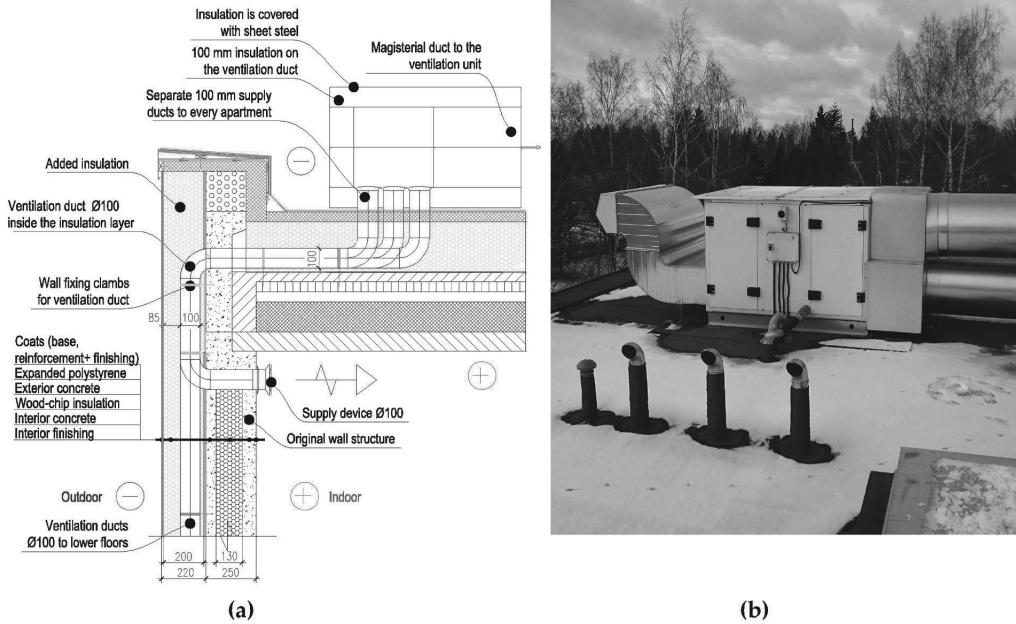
(a) Ventilation ducts on the wall and (b) HRV ventilation unit on the roof.
